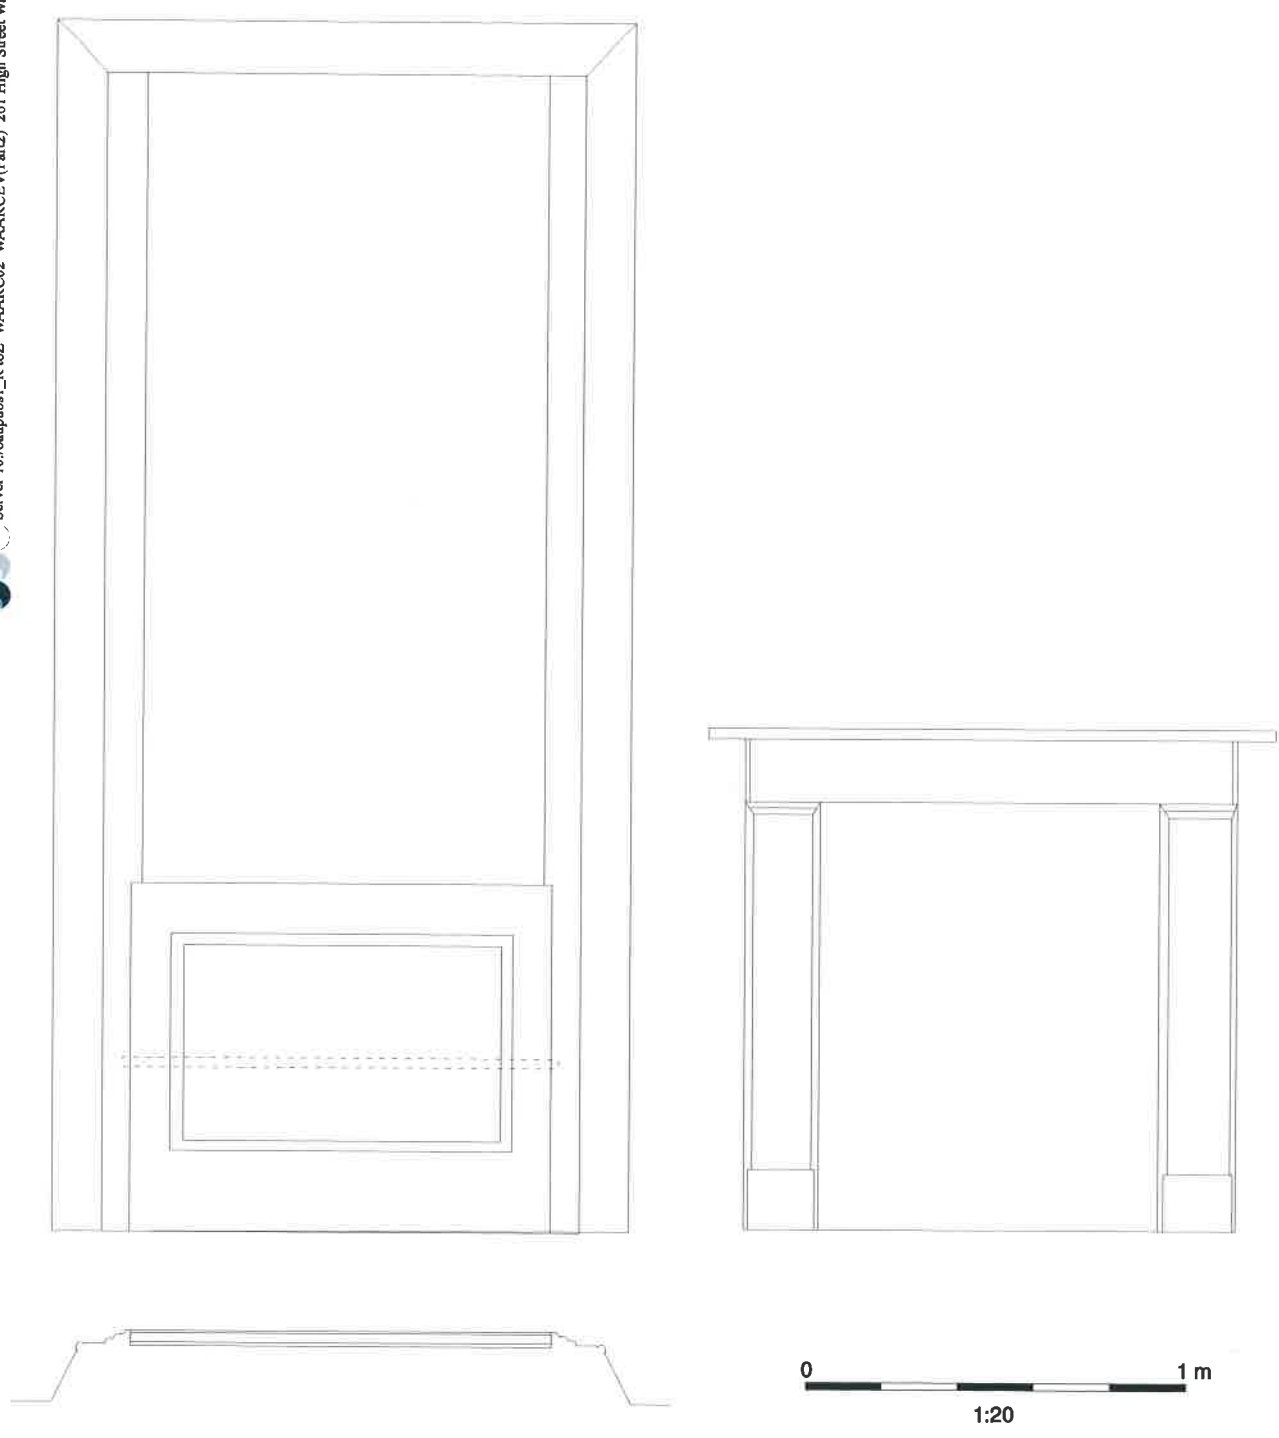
Window and fireplace detail 261 High Street, Walthamstow
